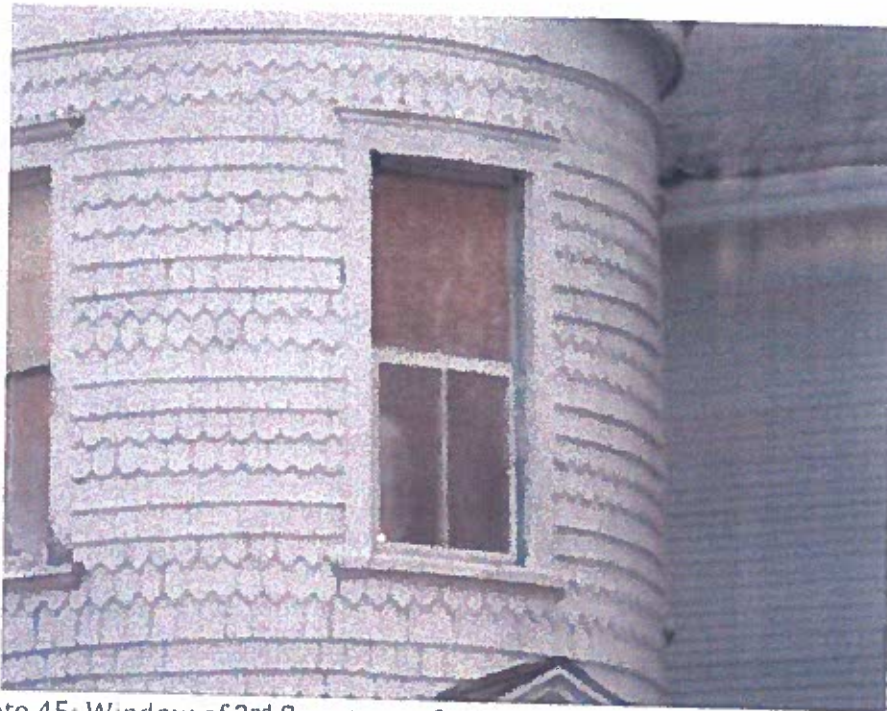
Window of 2<sup>nd</sup> floor turret facing northeast. Panes are broken and window is pain shut. May not operate.
